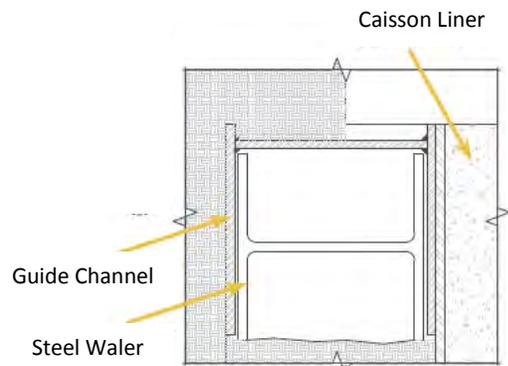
Guide channel containing steel waler fastened to caisson liners
